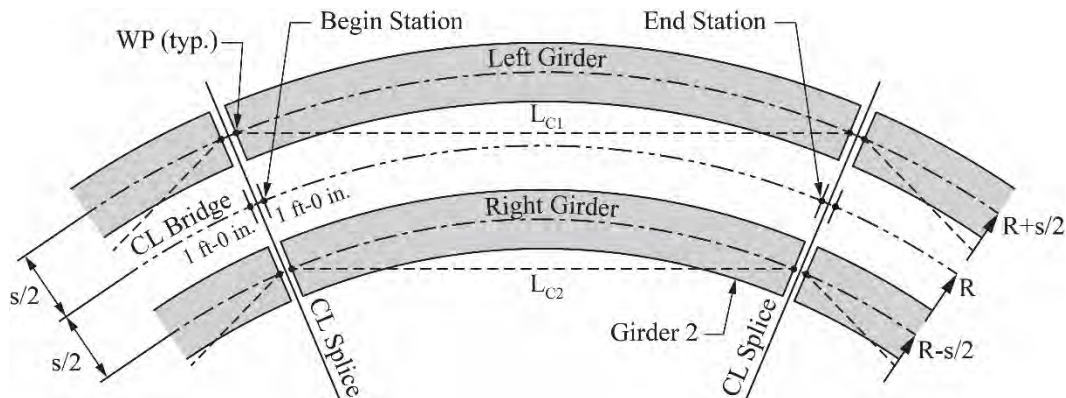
Typical U-Girder Cross Section Showing Horizontal Control and Working Point
